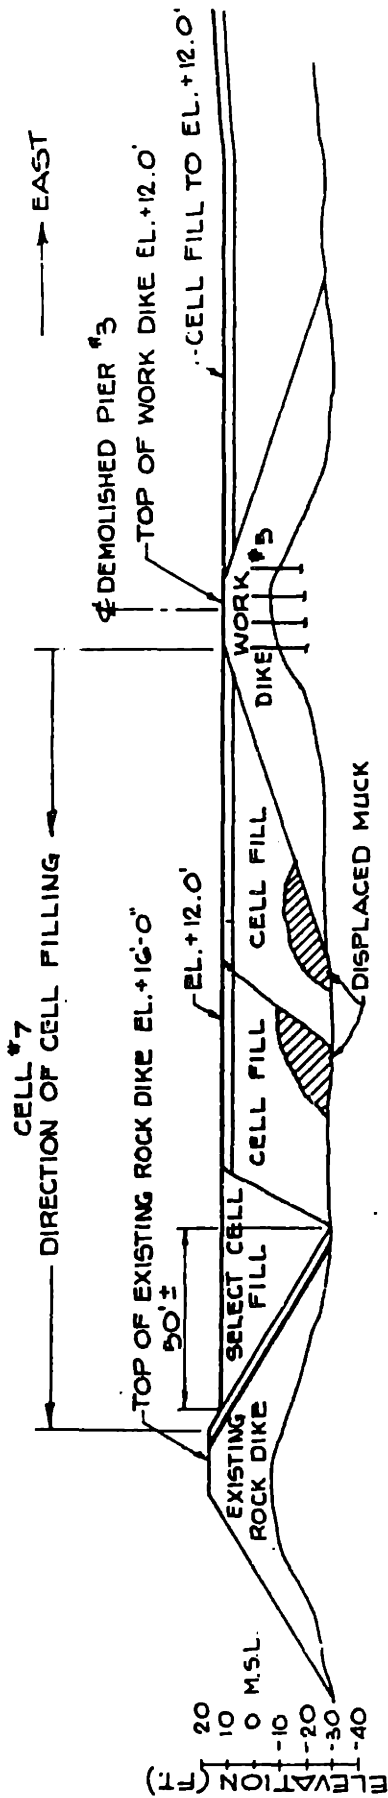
Typical Cross-section of Embankment 'B' (Cortell, Jason M., 1980)
